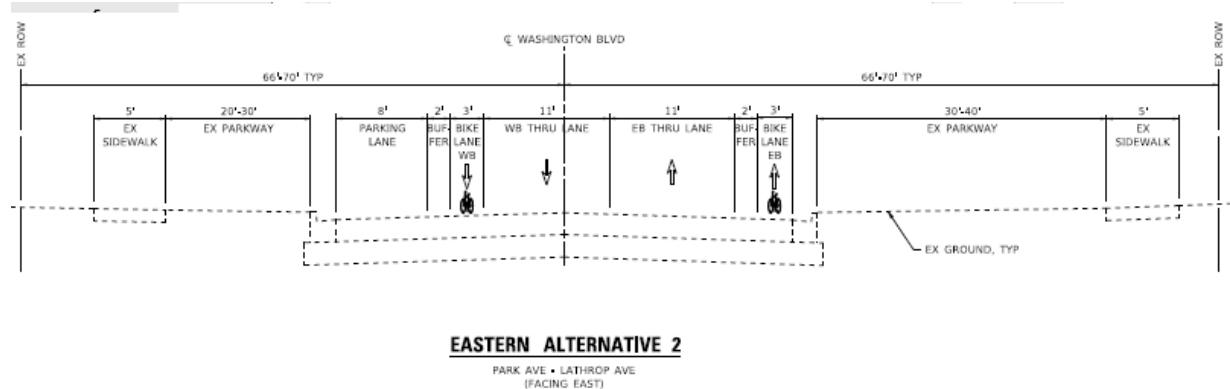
Eastern Typical Section Alternative 2 Washington Blvd.
